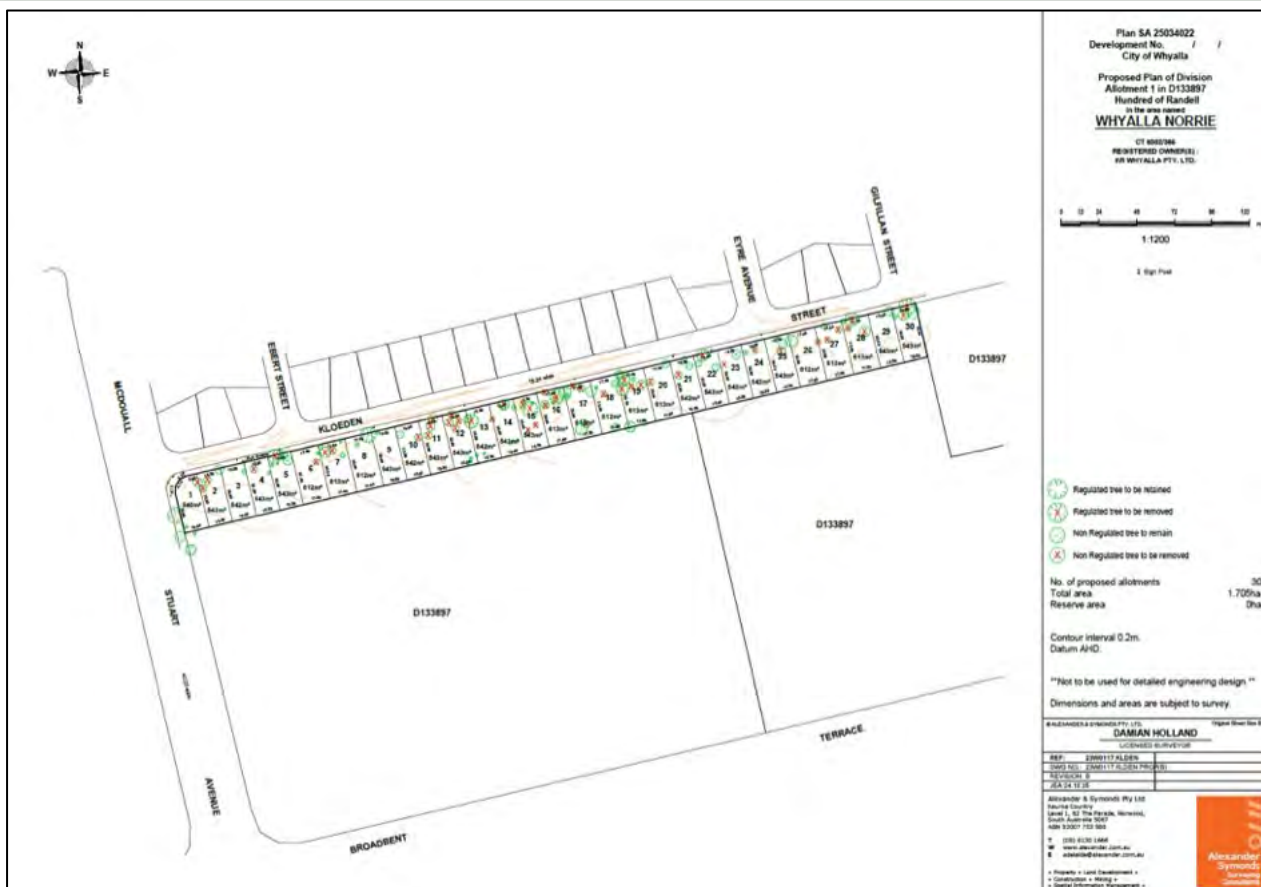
Proposed Torrens Land Division for Lot 1 Kloeden Street, Whyalla Norrie, South Australia 5608 (CT 6302/365). Plan provided by UrbanLux Constructions on 27/01/2026.
